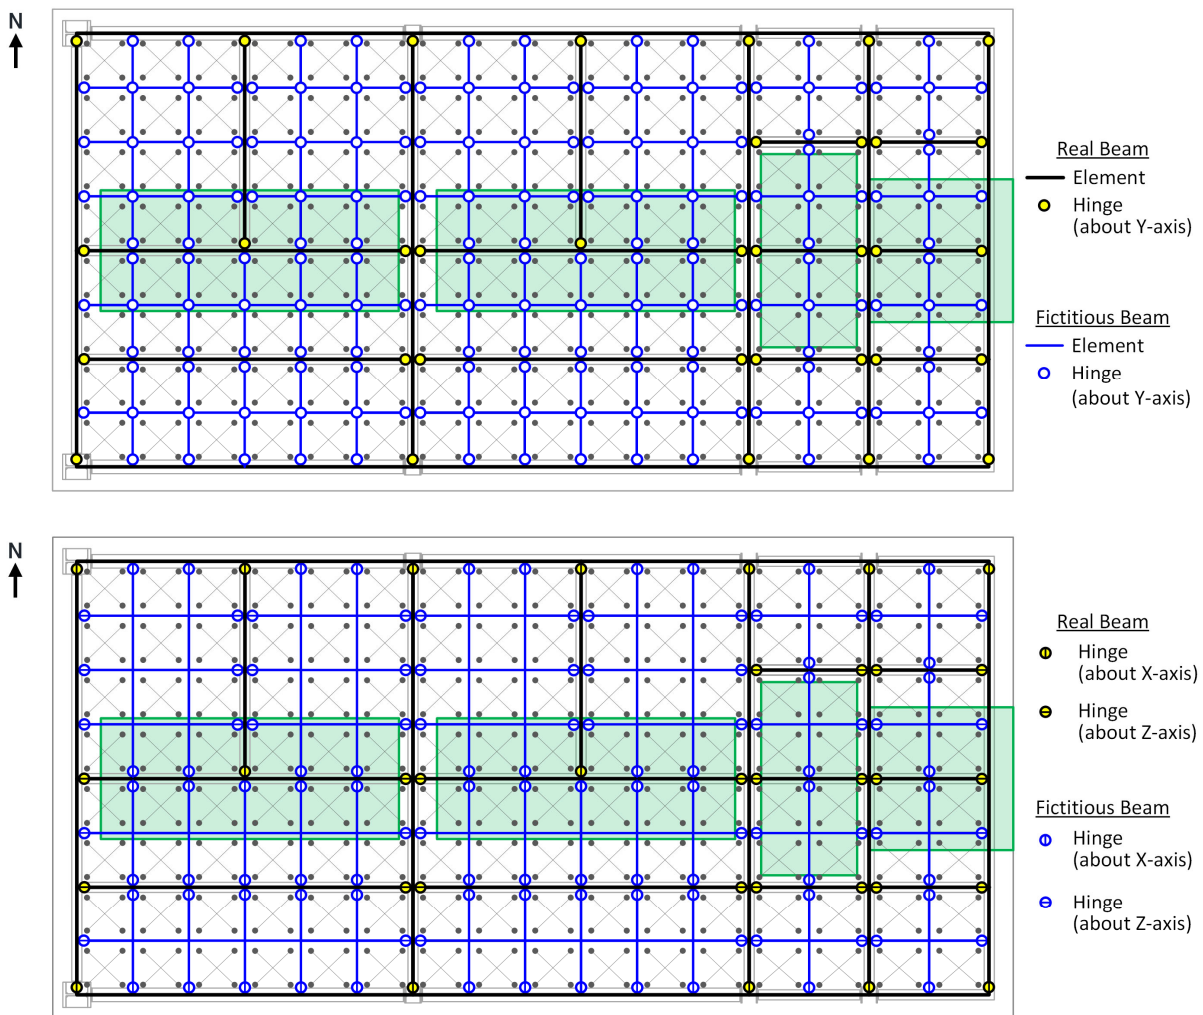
Layouts of Floor Beams, Slab Beams and Slab Trusses for BT Model
